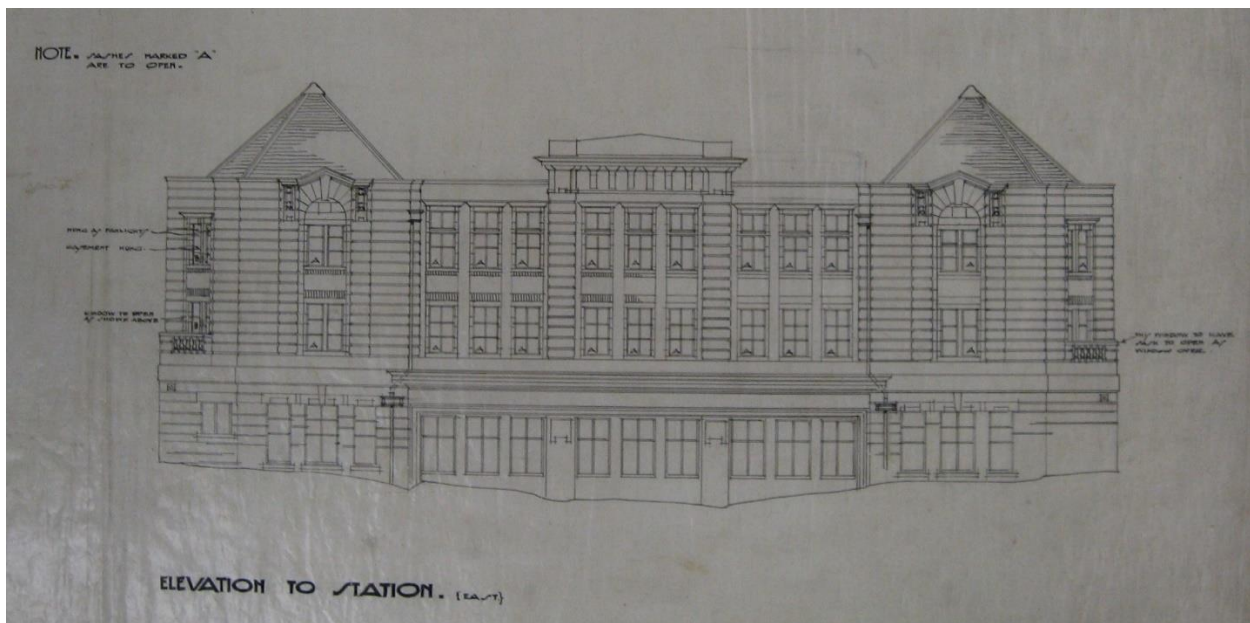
Elevation to Station (east) - Parcels Post Office premises at the Central Railway Station, Sydney. Plans of additional storeys. Sheet 3, 7/5/1912.
